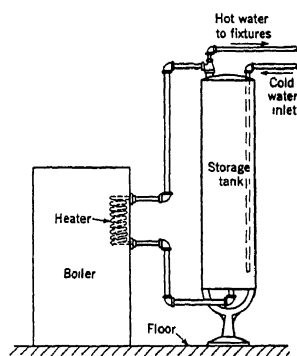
INDIRECT WATER HEATER PLACED IN BOILER
